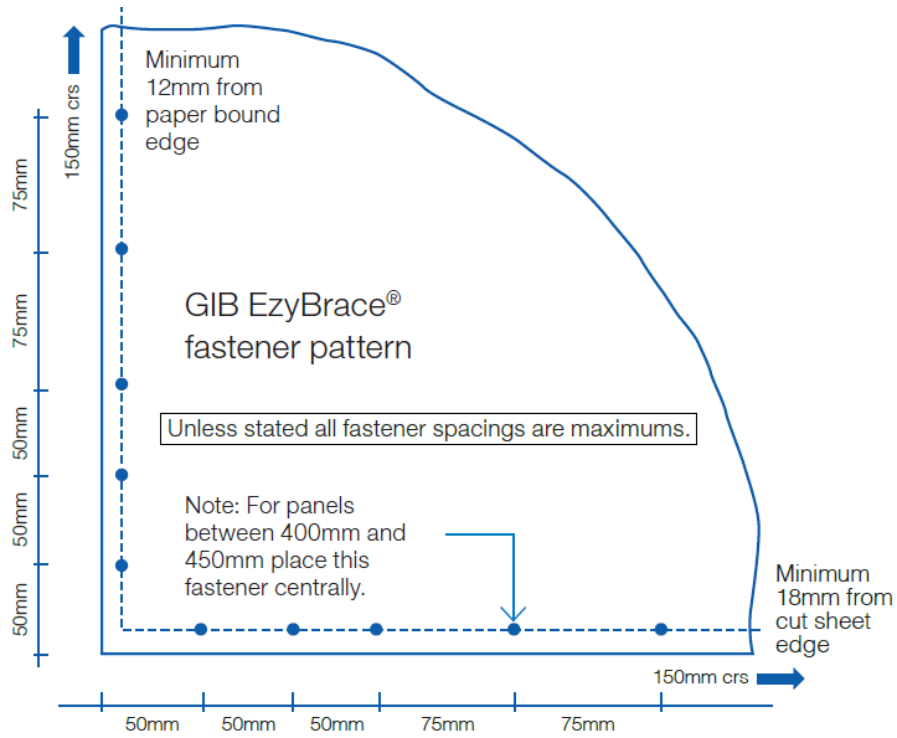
Fastener spacing on plasterboard lining (GIB, 2016)
